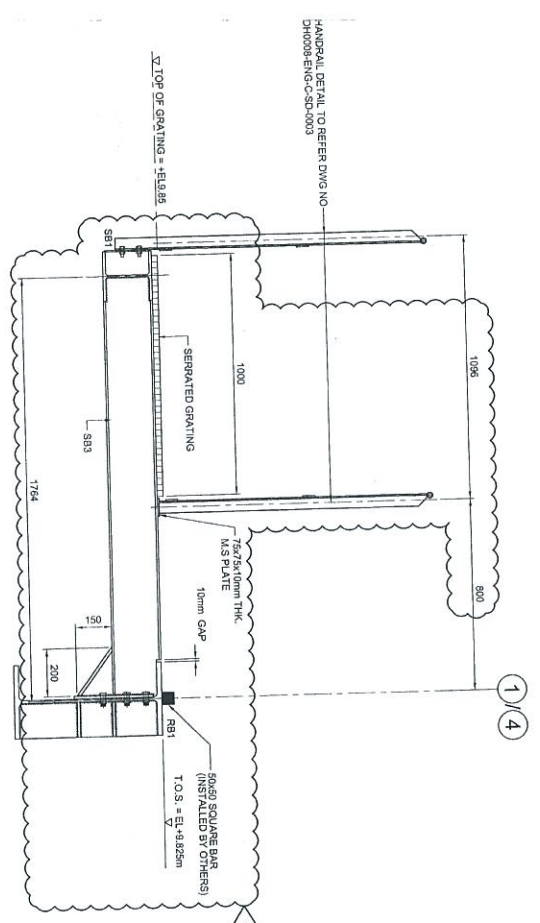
DETAIL OF CRANE GIRDER CG1 (PLAN - T.O.S.=+EL9.825)
